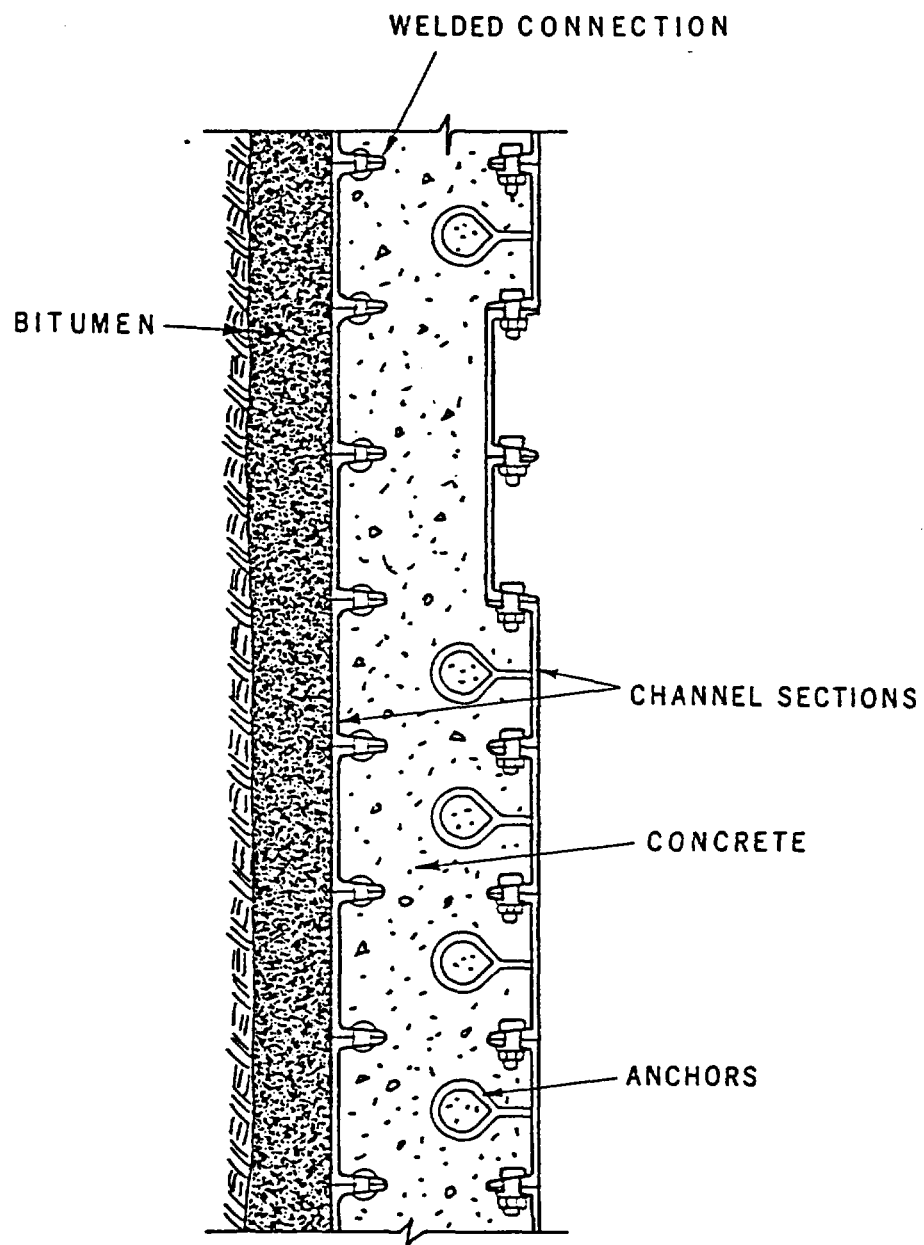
Construction of Floated-In-Place Composite Lining used on the Beatrix Shaft
